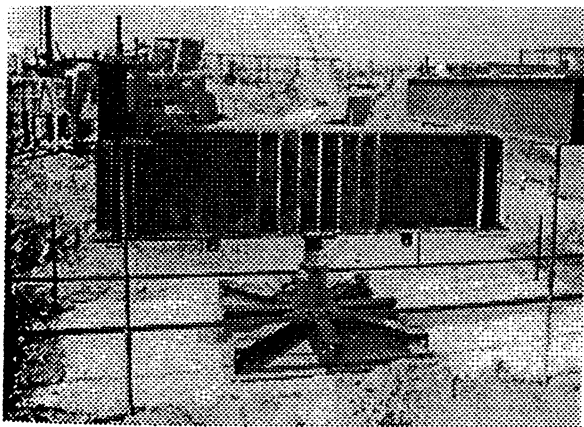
Static load test assembly on stone column-reinforced soil.
